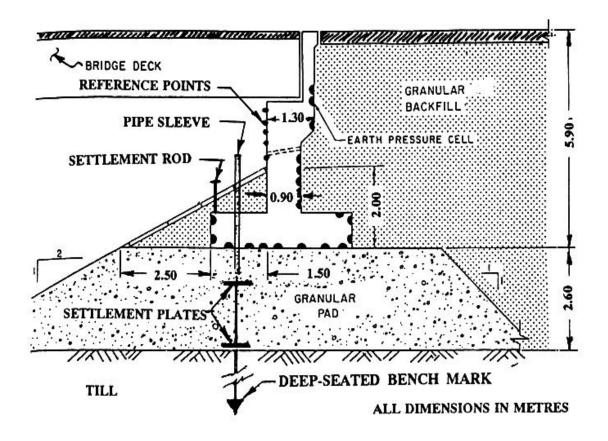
Shallow Footing with Instrumentation, Felio (1994).
